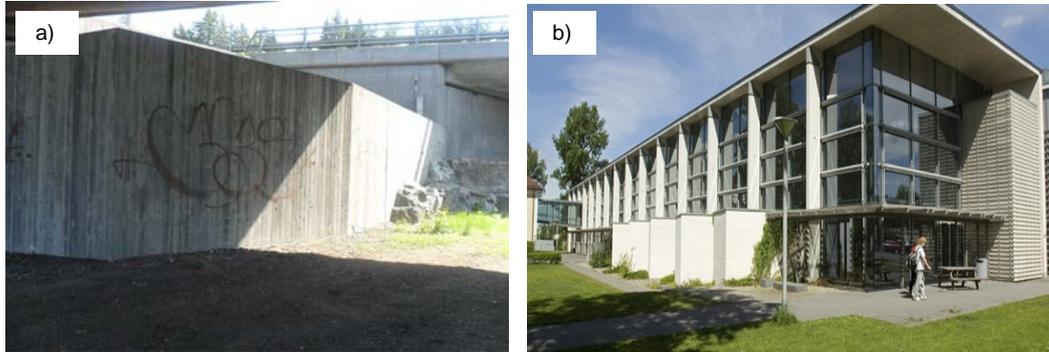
a) Concrete retaining wall with recycled coarse aggregate content of 780 kg/m³ (Highway E6, 20 km south of Oslo, Norway) b) Concrete foundations, columns and basement walls with recycled aggregate content of 269 kg/m³ (Sorumsand High School, Norway)
